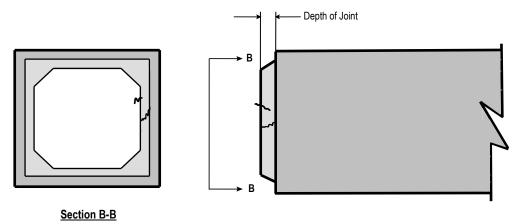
Acceptable Fractures or Cracks Two end cracks that do not exceed depth of joint
